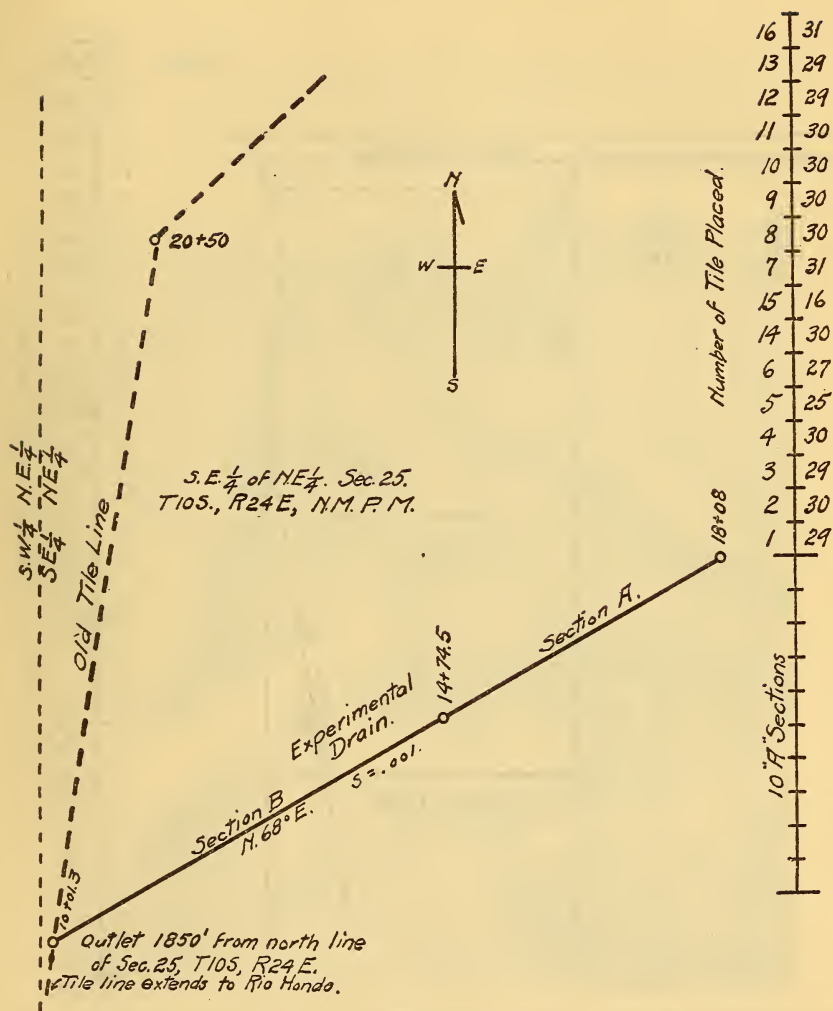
Showing location, plan, and arrangement of experimental drain tile at Roswell, N. Mex.
